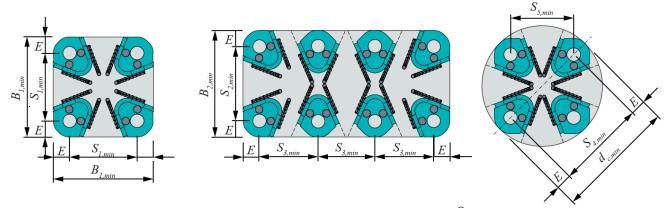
Examples of geometries and minimum spacings of HELKA® Column Shoes
